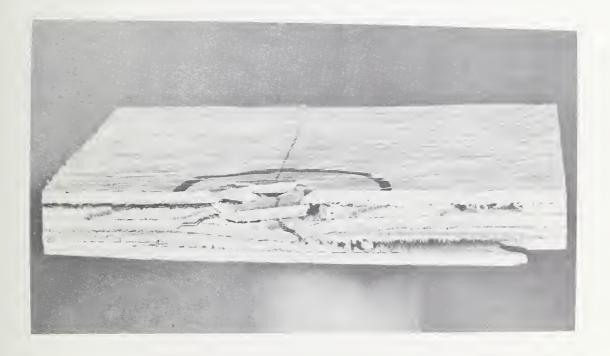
TYPICAL FAILURE MODE OF FLOOR SYSTEM B LOADED OVER A 5/8 in. DIAMETER AREA diameter disc was ruled out on the basis of tests performed at location 5 on floor system C where it caused a residual deflection in excess of 1/16 in under a 400-1b load. Data for these tests are shown in table 5.1.
